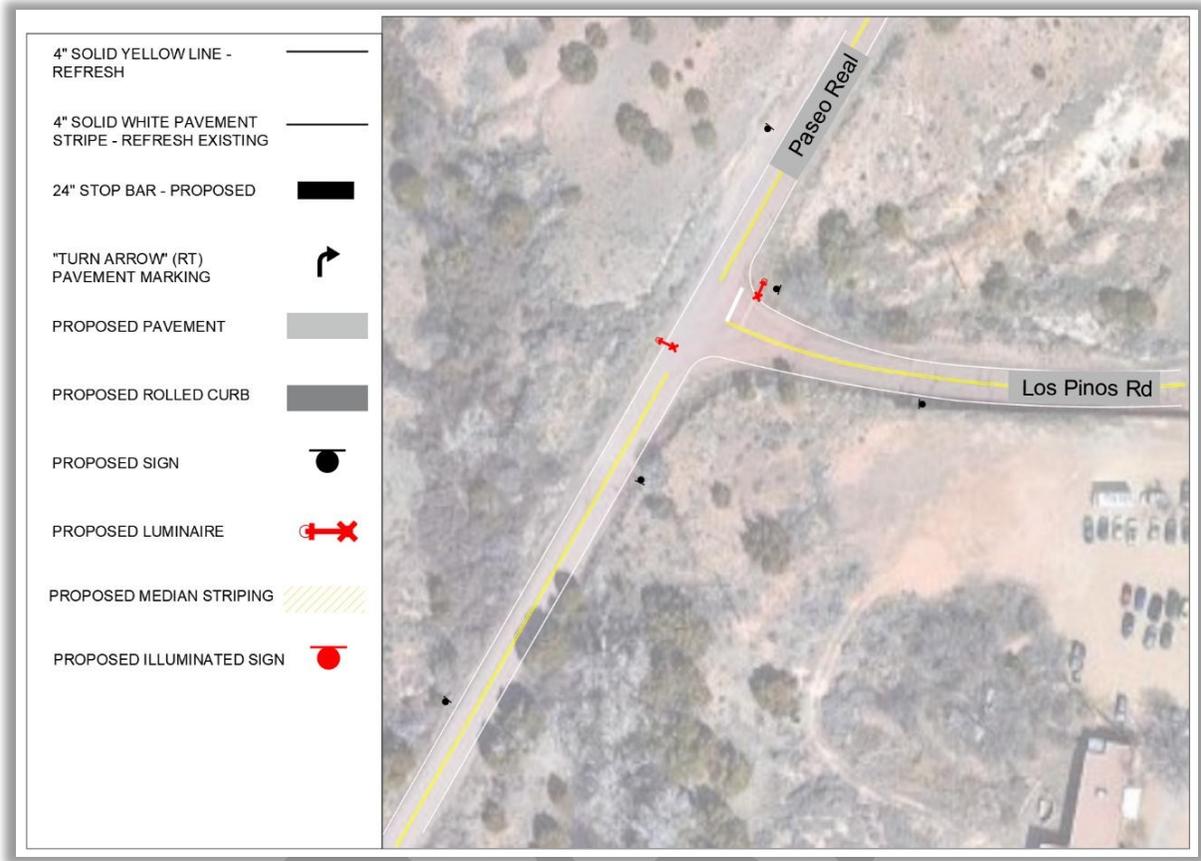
Conceptual Layout with proposed Luminaire locations (Los Pinos Road & Paseo Real)
